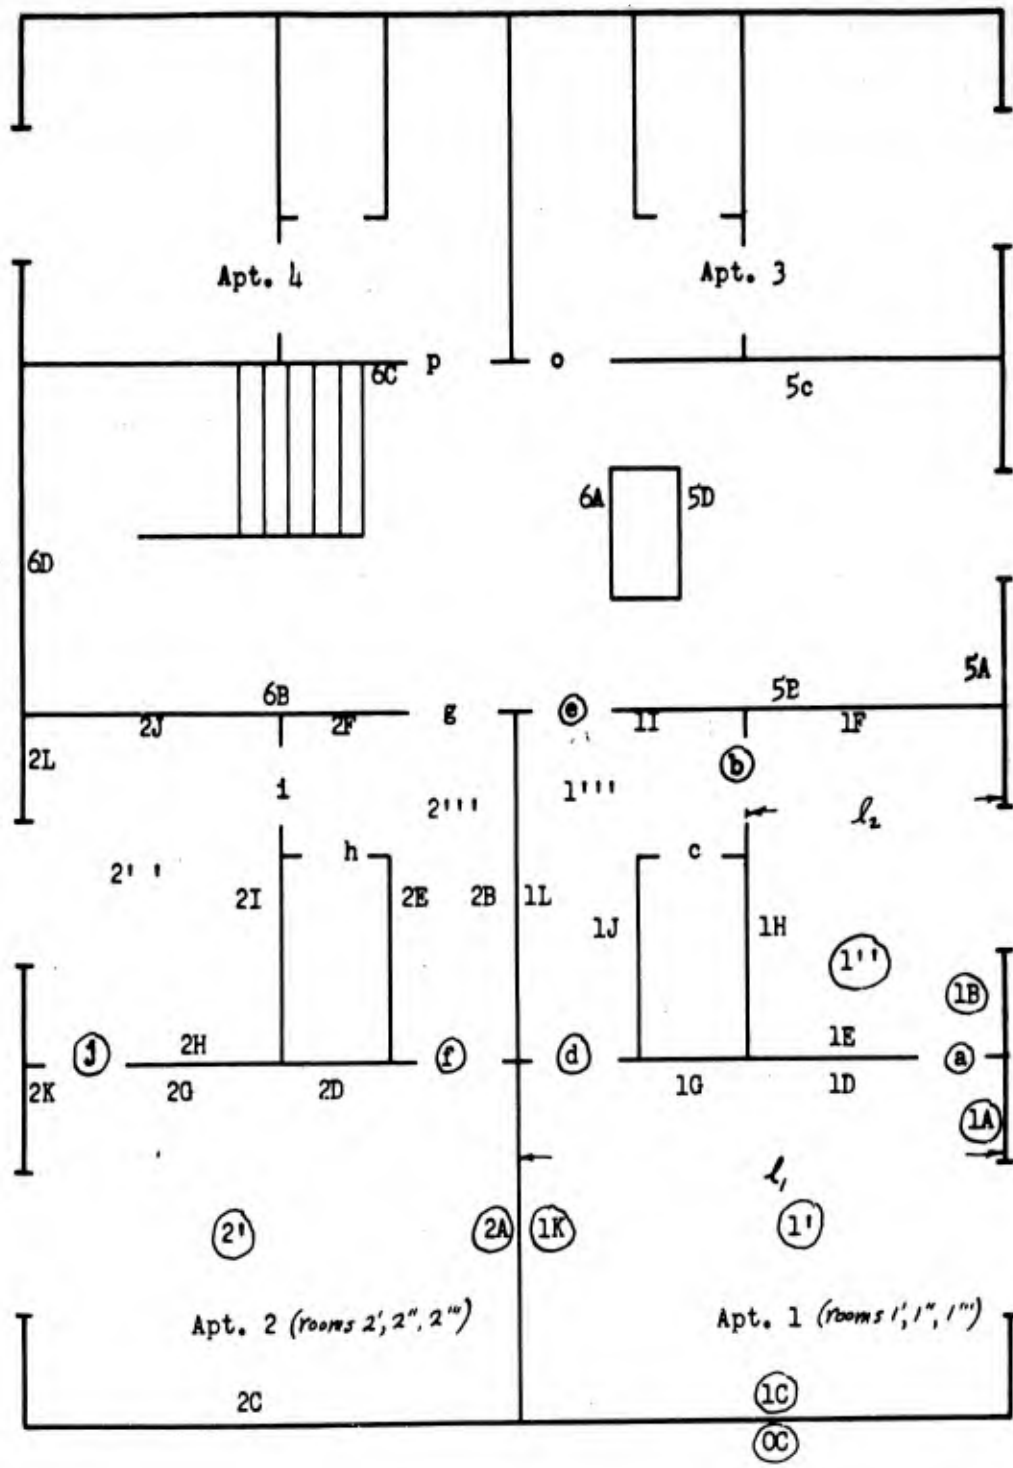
First Floor Plan Nomenclature of 3.3.5 Type Buildings
